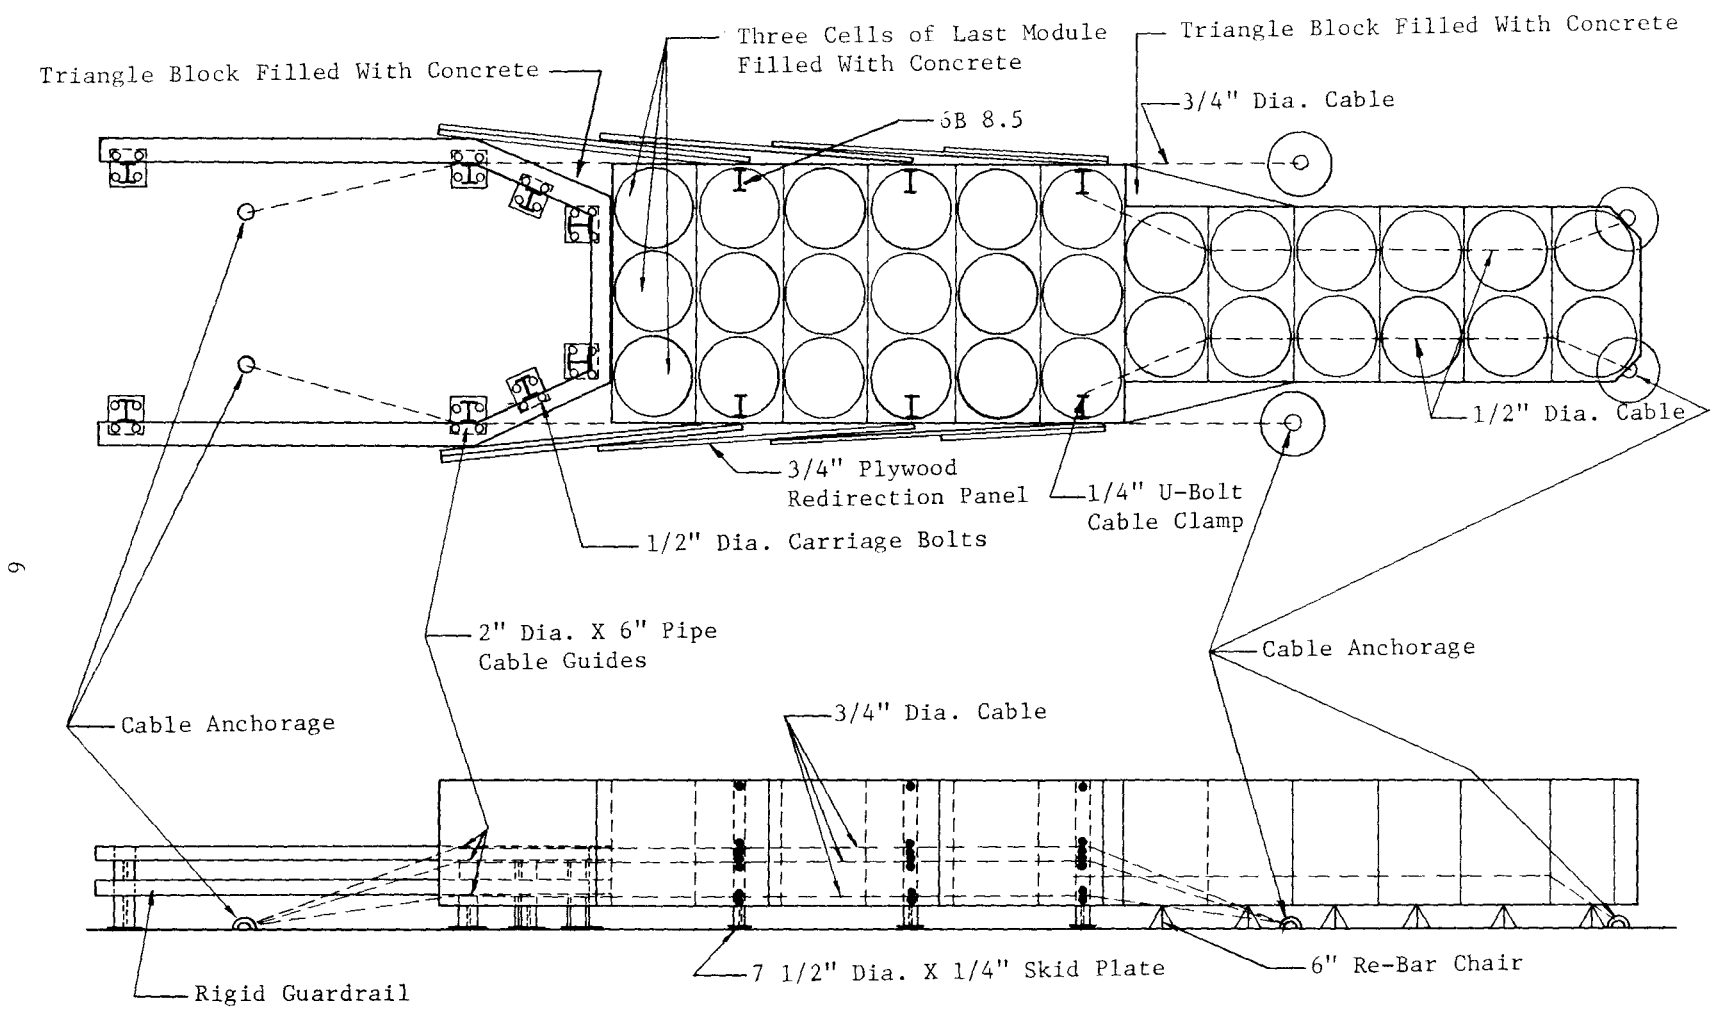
, Details of Concrete Crash Cushion (Tests FLA-1 & FLA-2)(Mod II).
